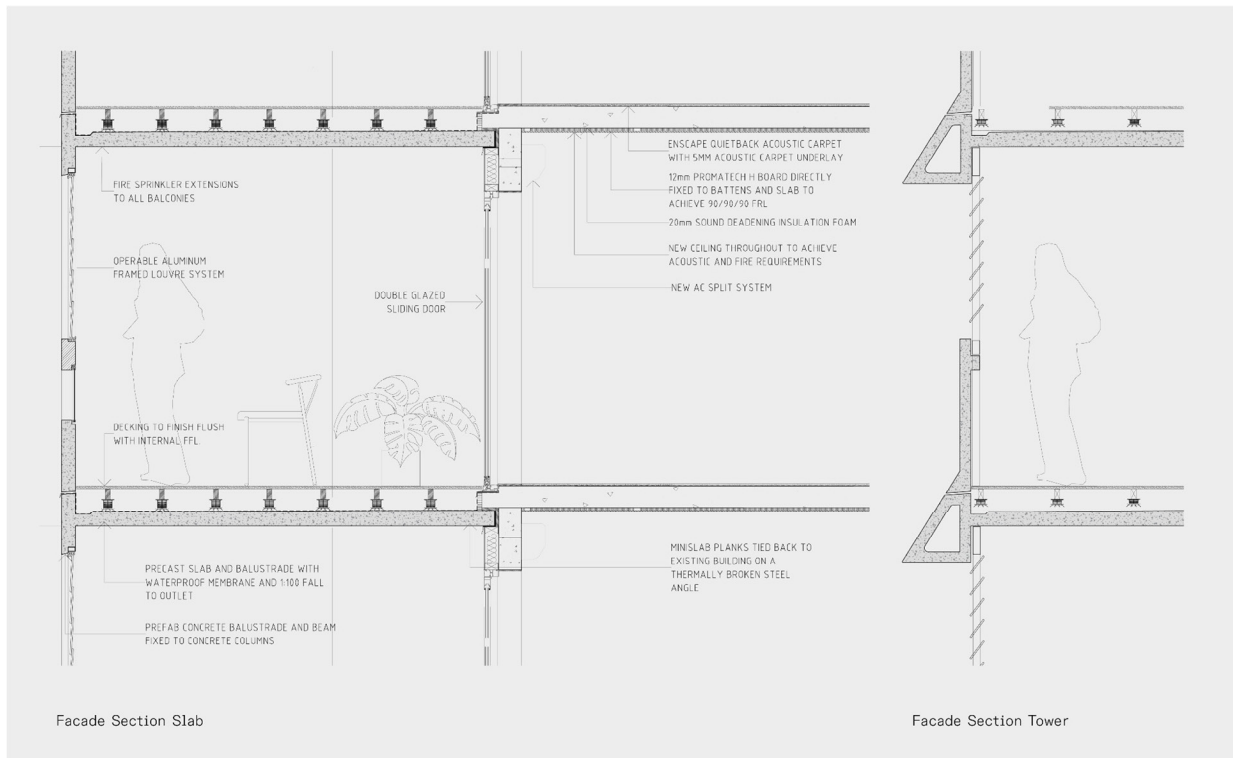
Sectional detail of the new balconies and building fabric upgrades.
